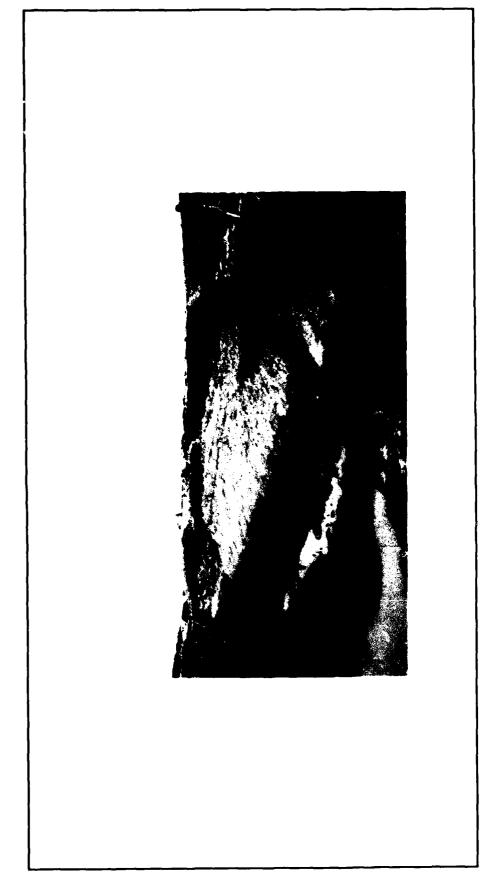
Photograph of failure of unreinforced embankment at Bonnet Carre'
